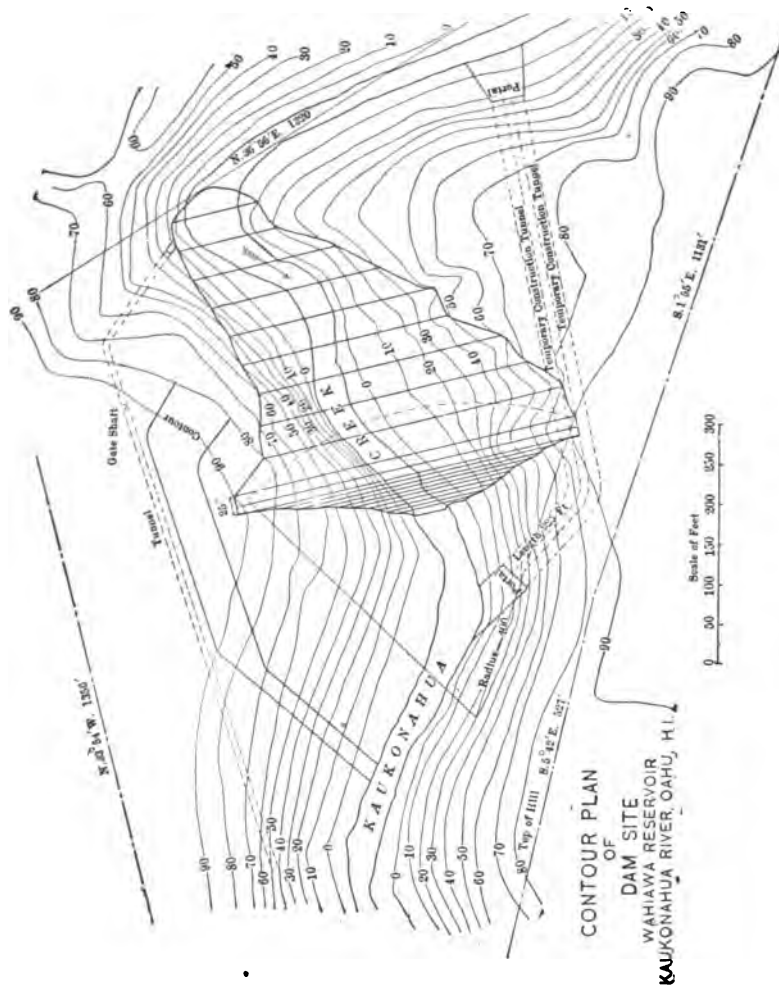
CONTOUR PLAN OF WAIHUA DAM.
